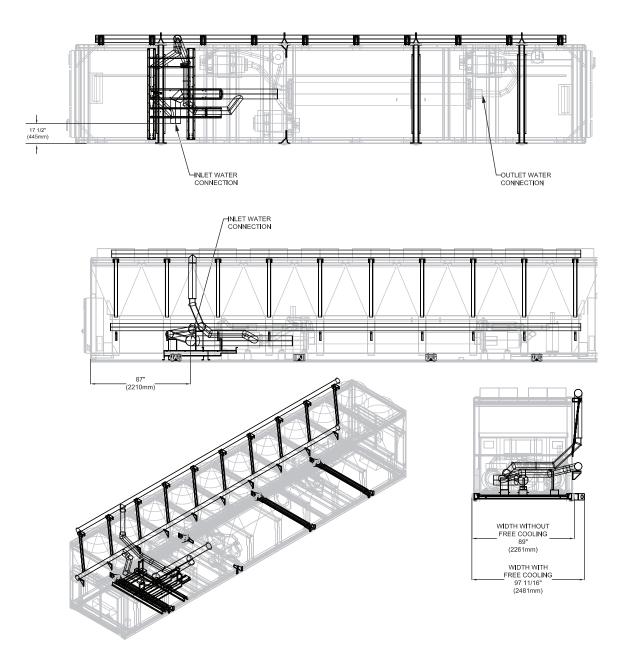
RTAF unit dimensions - 310, 350 ton units with free-cooling
